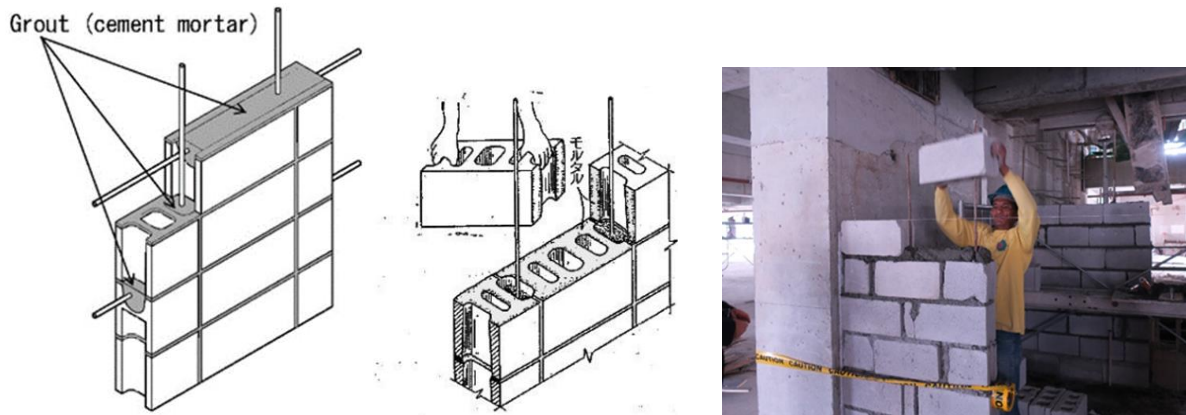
Stack bond is recommended to avoid tough work to lay blocks with the rebar inside hollows.
